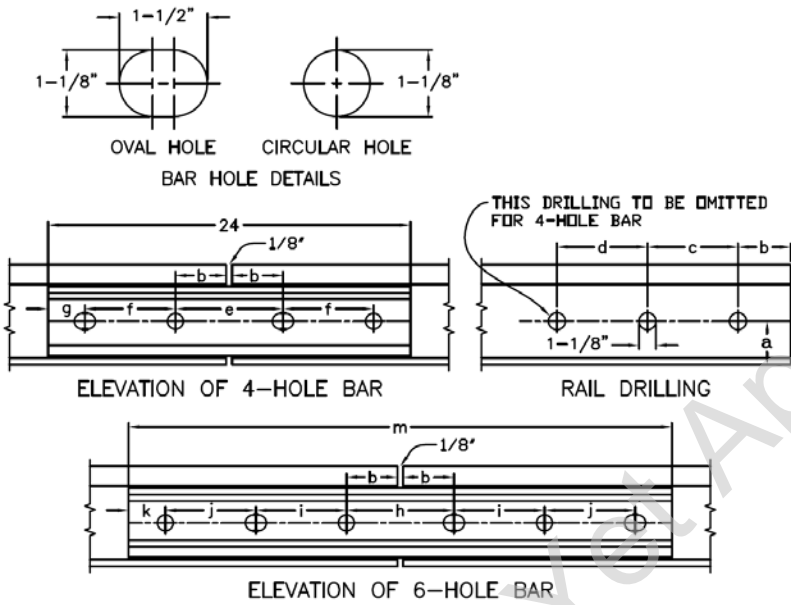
XX Recommended Rail Drilling and Bar Punching for 133RE, Utilizing 1-1/16" inch Track Bolts
